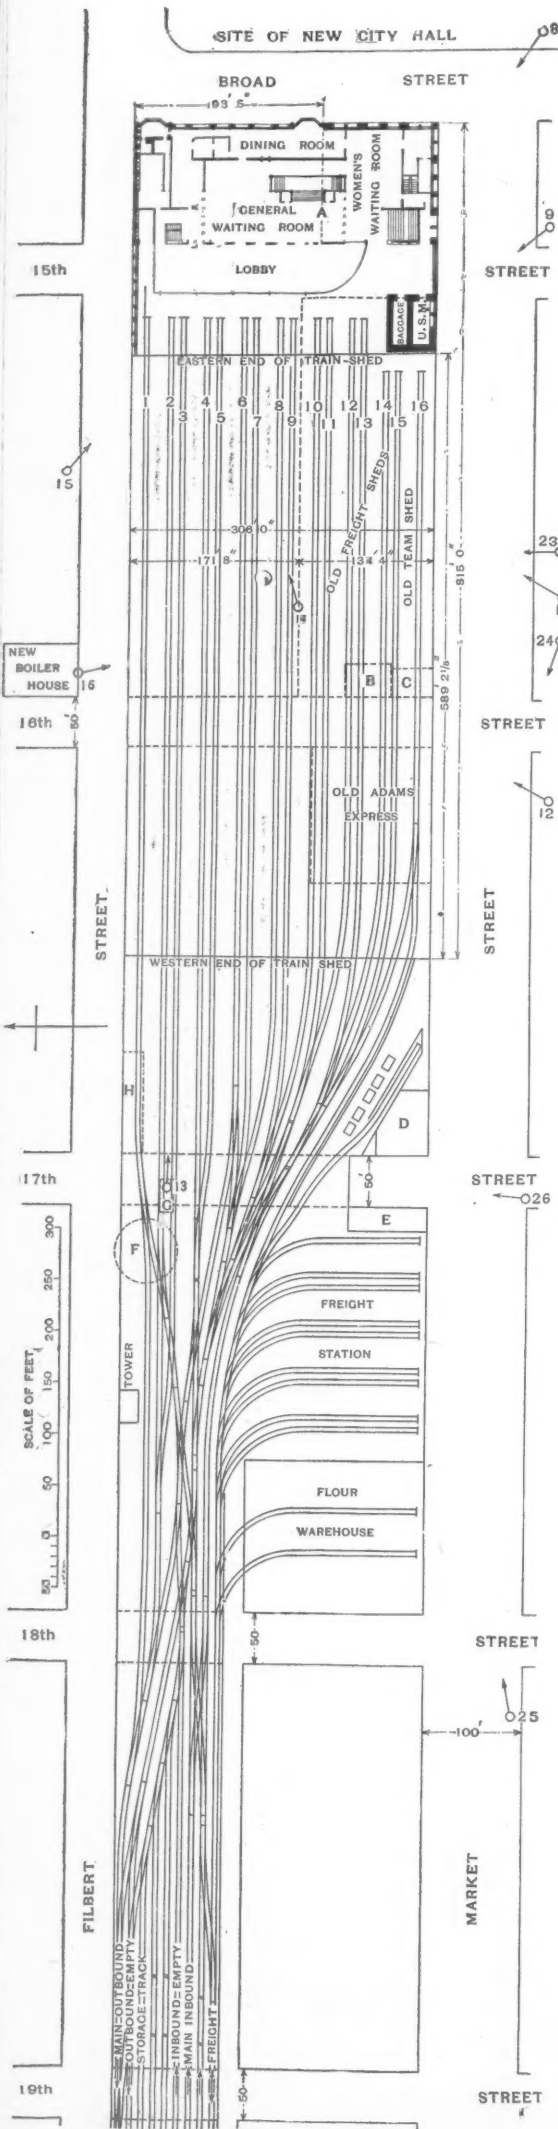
New Plan of Tracks, Pennsylvania Railroad Terminal, Broad Street, Philadelphia.
